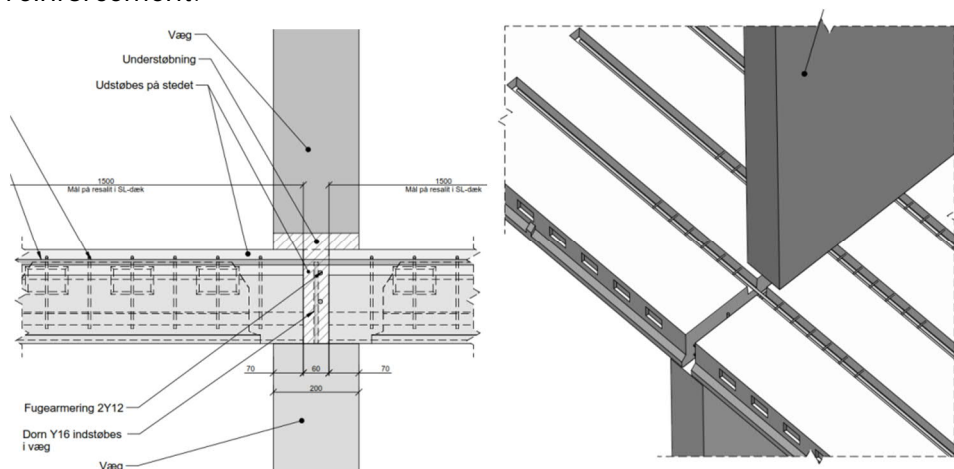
Fixed end connection over the wall: detail (left); perspective view (right); (Abeo A/S, n.d.)
